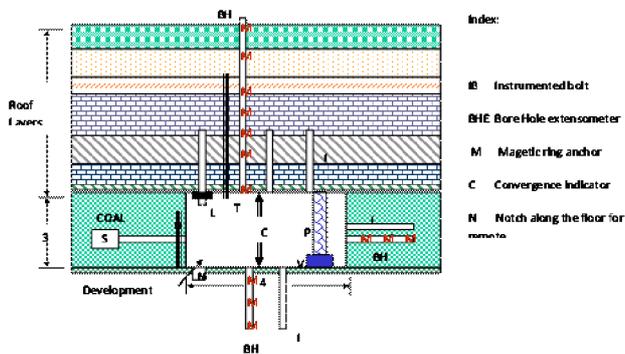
Typical instrumentation for strata monitoring around underground workings.
